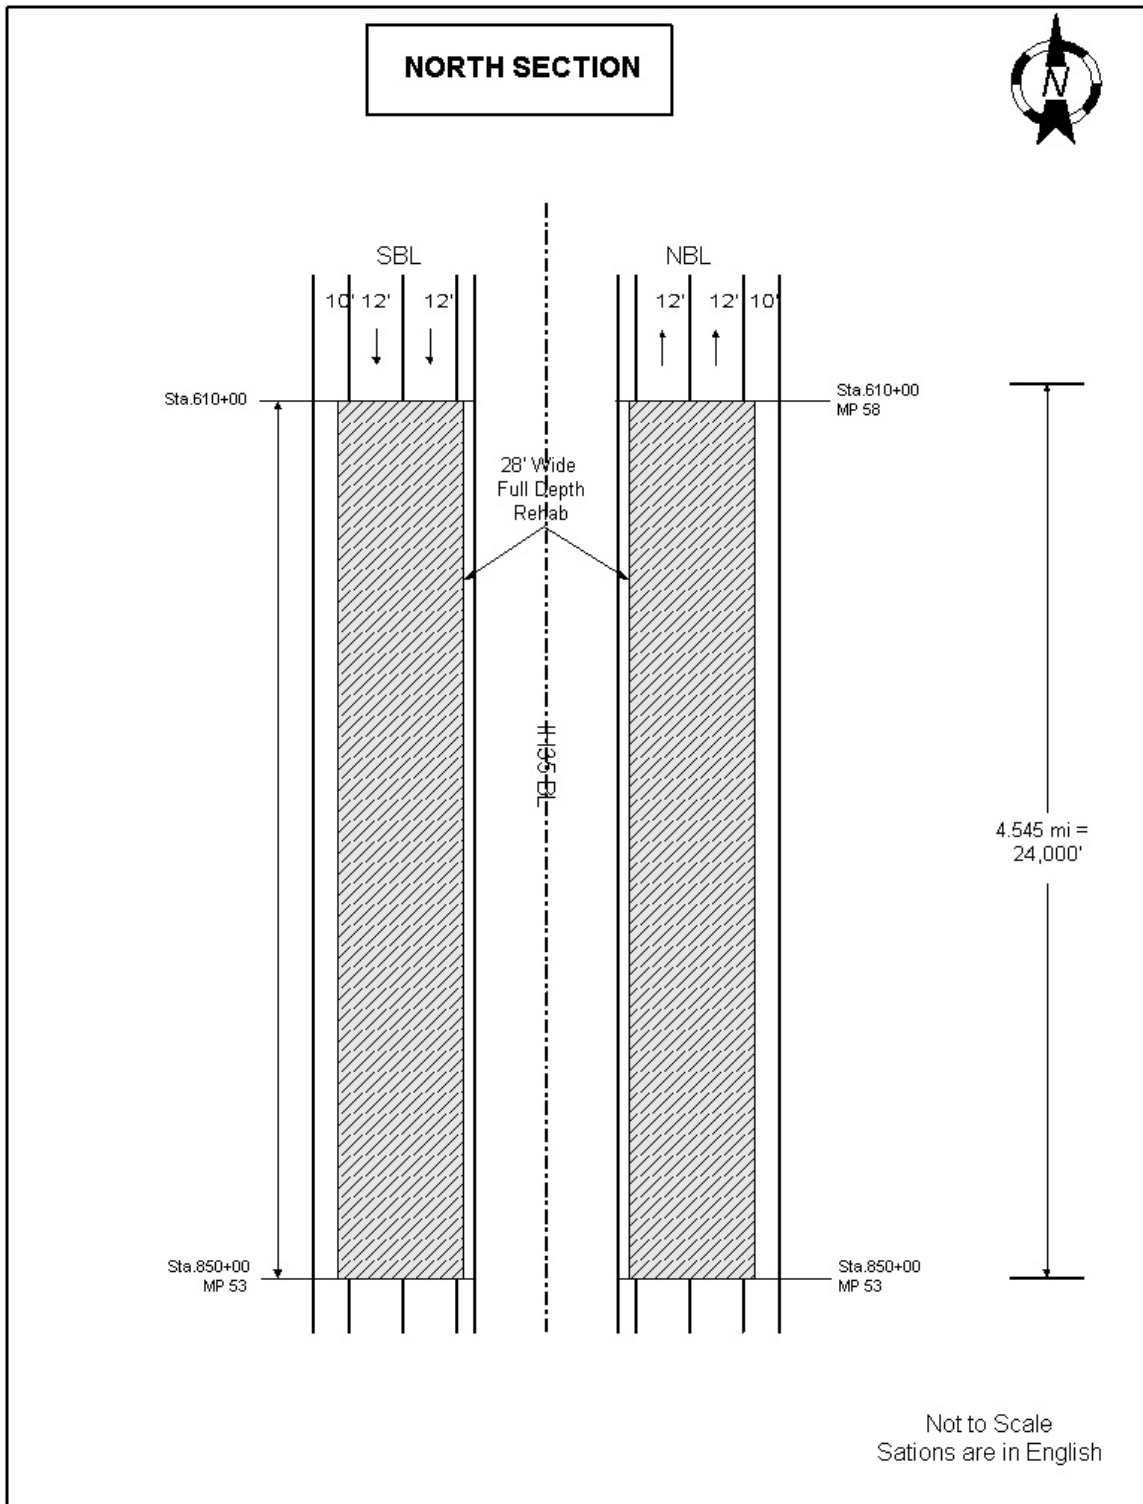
Plan View of North Section of IH 35 in Laredo District.
